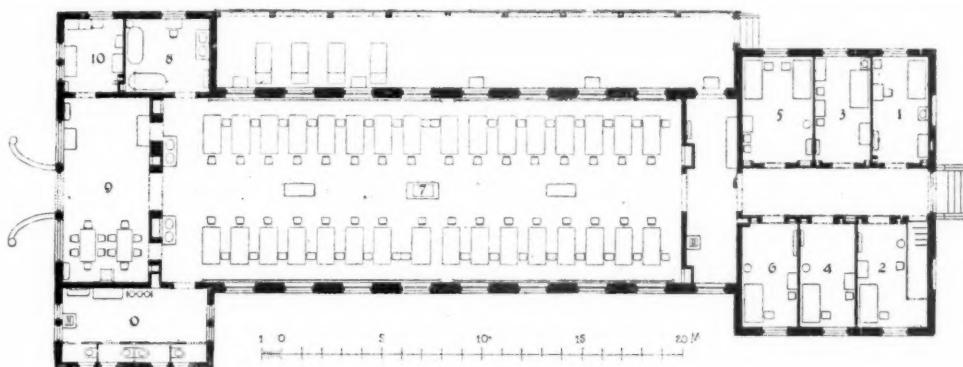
GROUND FLOOR PLAN OF PAVILION, NUERMBERG GENERAL HOSPITAL.
